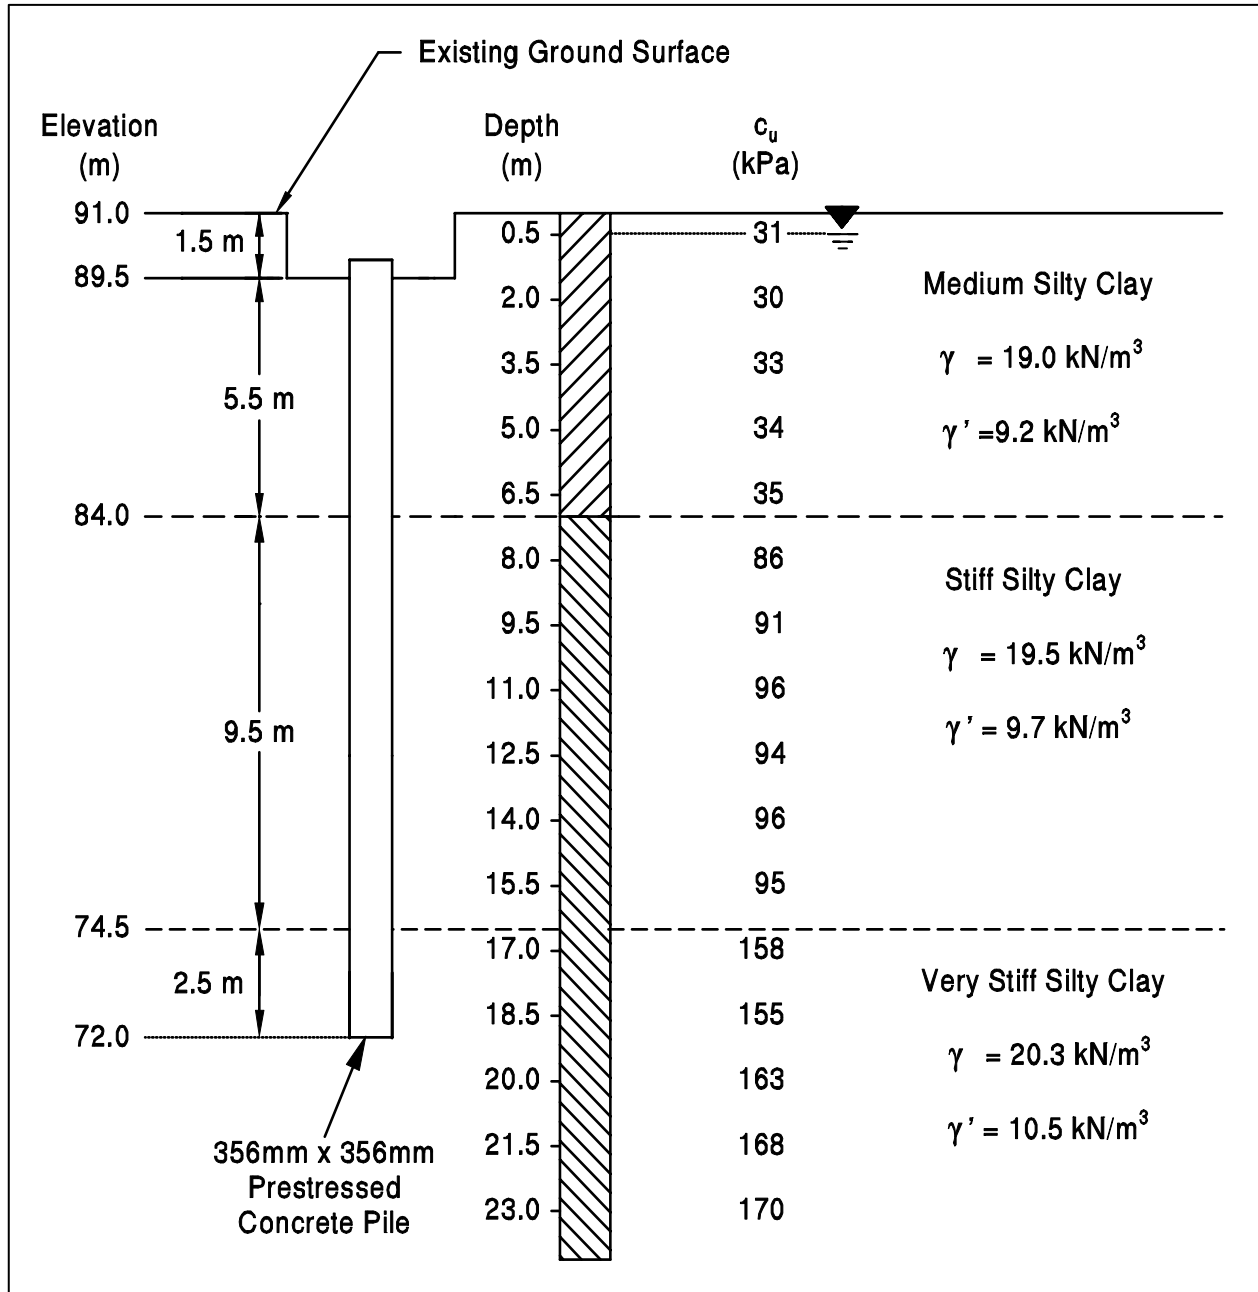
Interpreted Soil Profile from Soil Boring S-4 at the South Abutment
